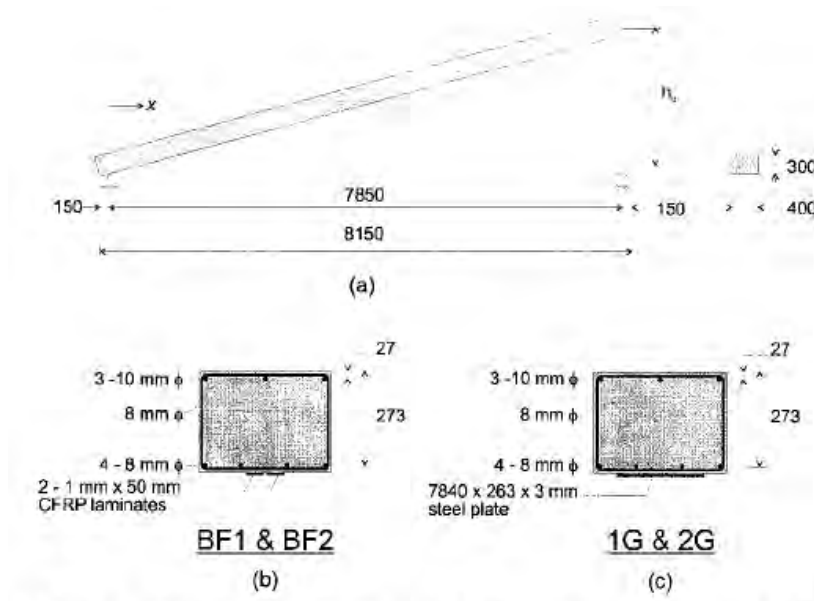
(a) Test set up and beam dimensions (b) BF-beam reinforcement layout (c) G-beam reinforcement layout used by Weder and Ladner (1981). (Erki and Meier, 1999)
